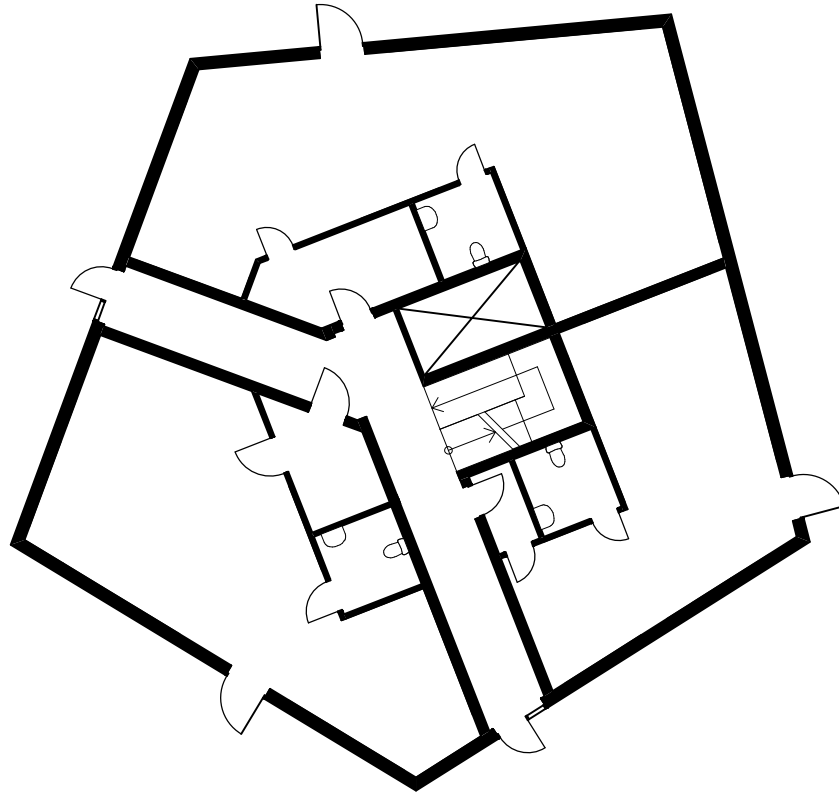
A tested concept where functions divided by building staircase, 1:200
